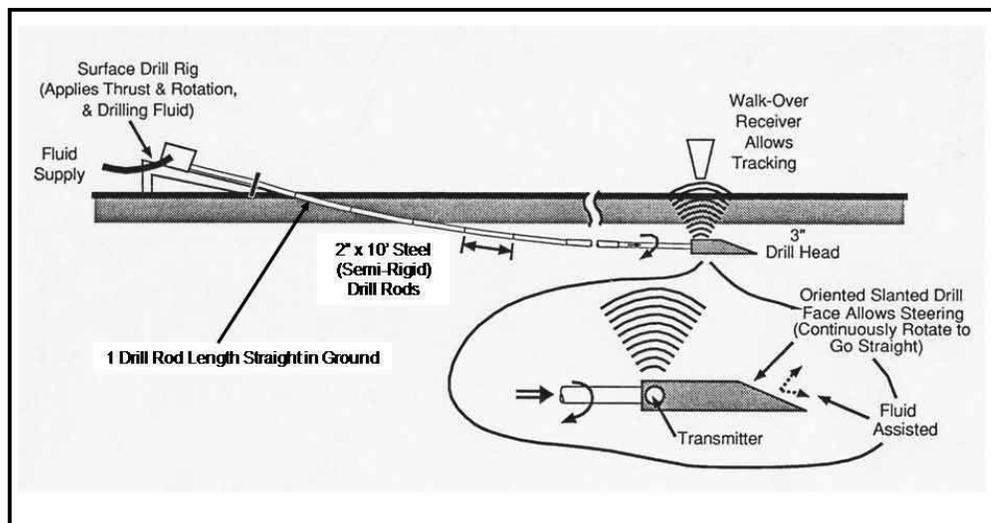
Typical Mini-HDD Equipment and Pilot Boring Process
